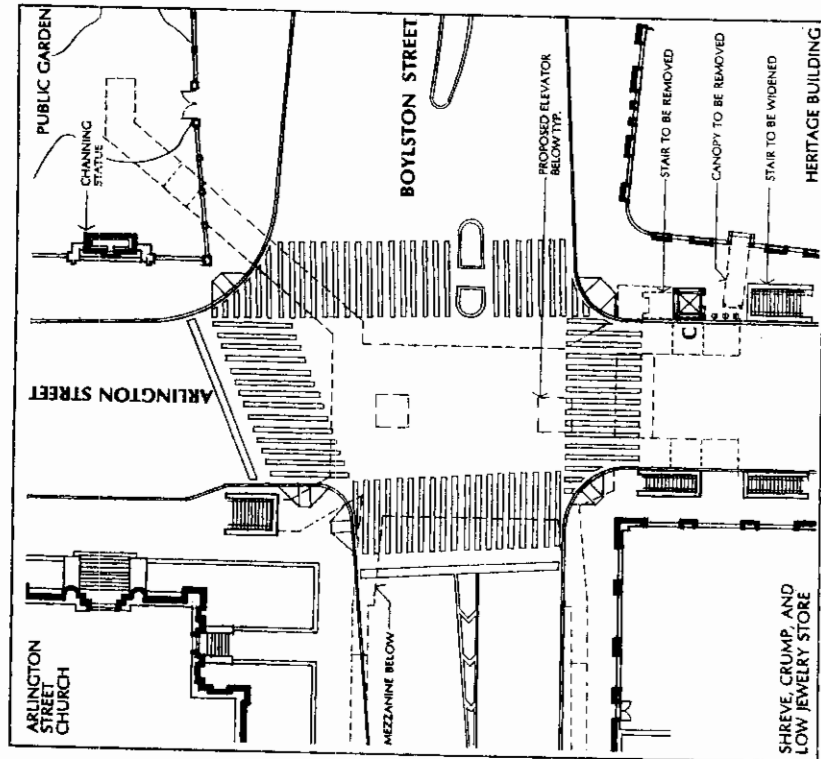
Elevator Option C, street level Scale: 1"=32'
